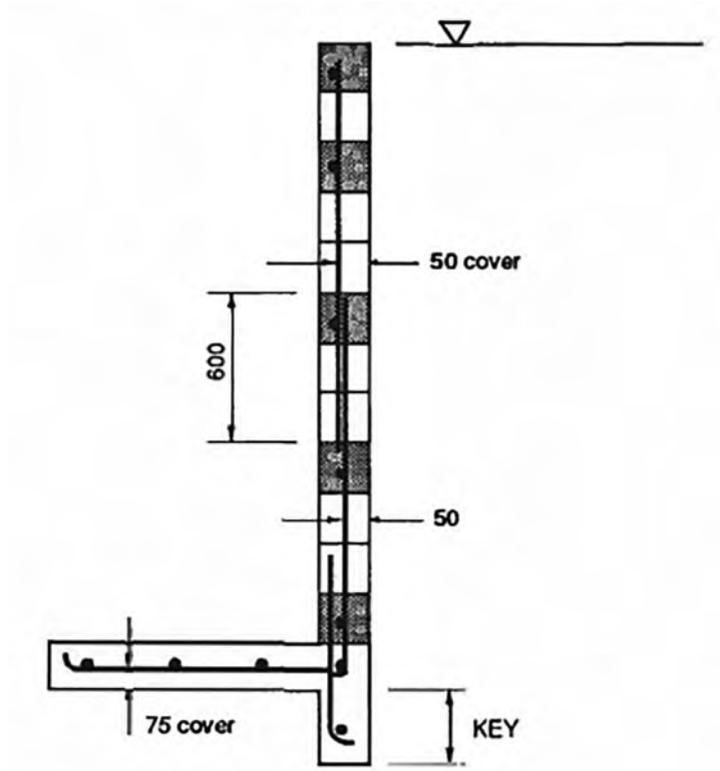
REINFORCEMENT DETAILS FOR TYPE 1 RETAINING WALLS
